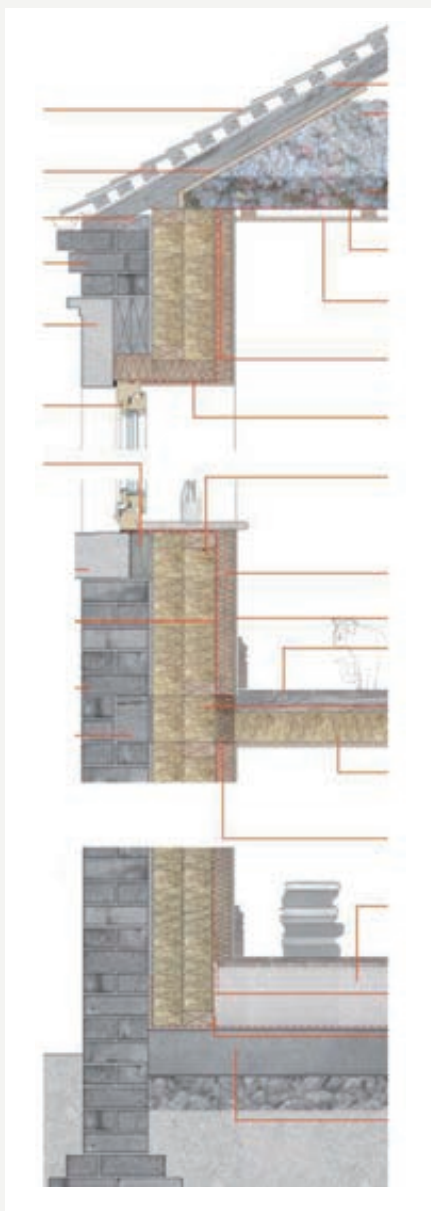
Front elevation section illustrating the wood fibre airtight membrane and sheeps' wool internal wall insulation.
